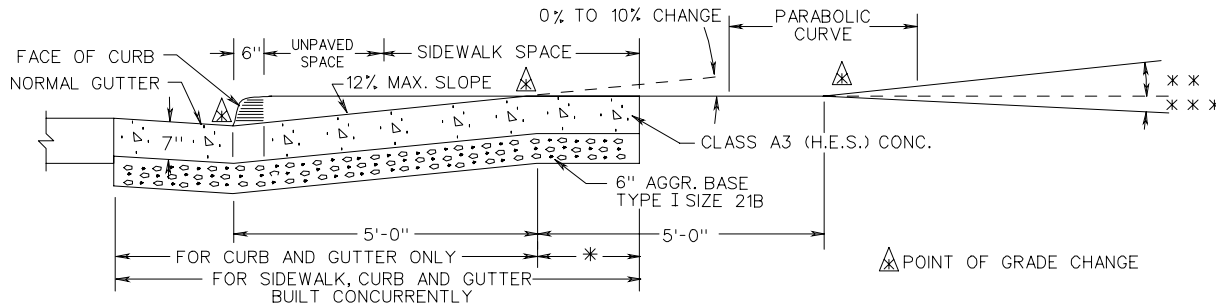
DETAIL TO BE USED WHEN THE COMBINED WIDTH OF UNPAVED SPACE AND SIDEWALK SPACE IS LESS THAN 7'.
